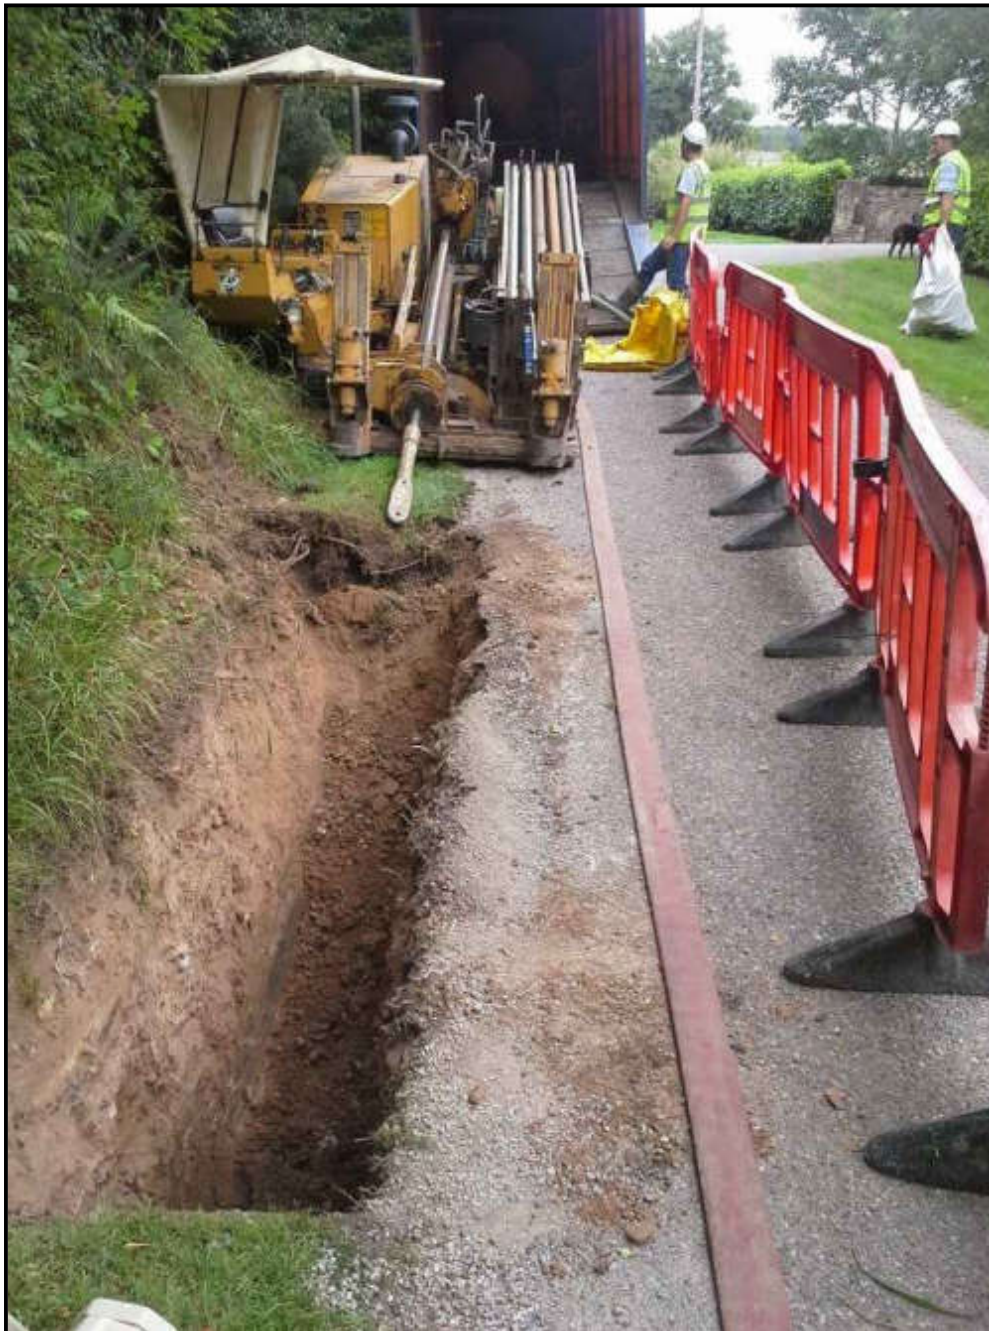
Grid Route example of horizontal directional drilling rig and launch pit
